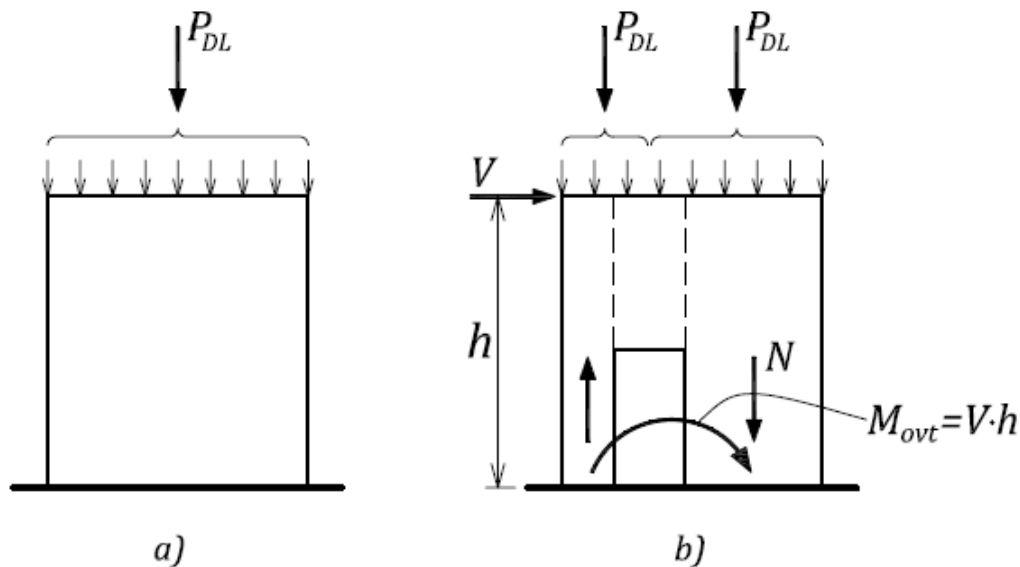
Axial load in masonry walls: a) solid; b) perforated.
